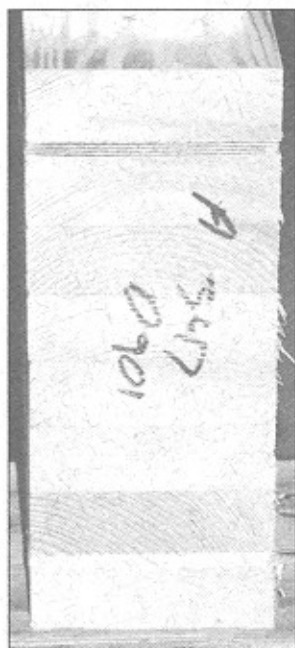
Cross-section of beam reinforced with carbon reinforced plastic sheets
